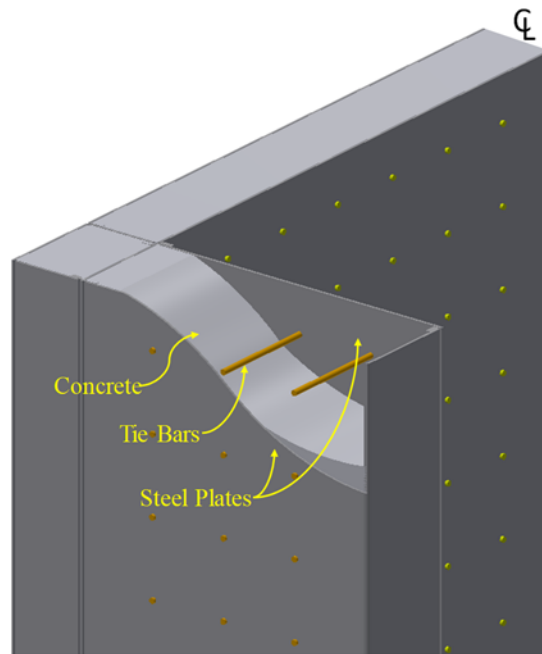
The main components of C-shaped Concrete Filled Composite Plate Shear Walls (C-PSW/CF)
